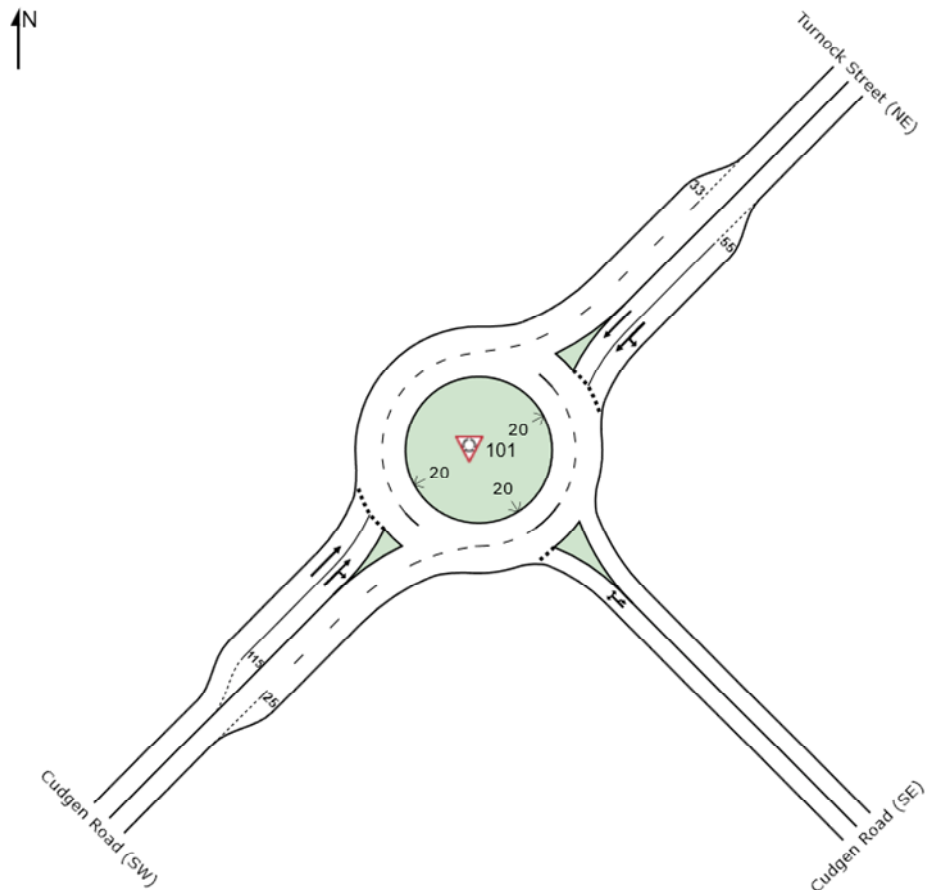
Cudgen Road / Turnock Street SIDRA Intersection Layout
